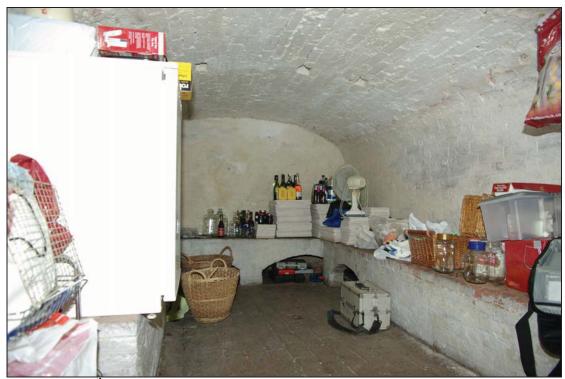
18th century cellar, with brick thrall and storage below. Looking east.
